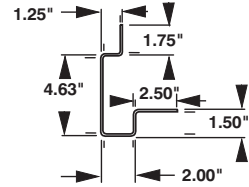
FULL ROOF CURB MODEL 1RC0455F
